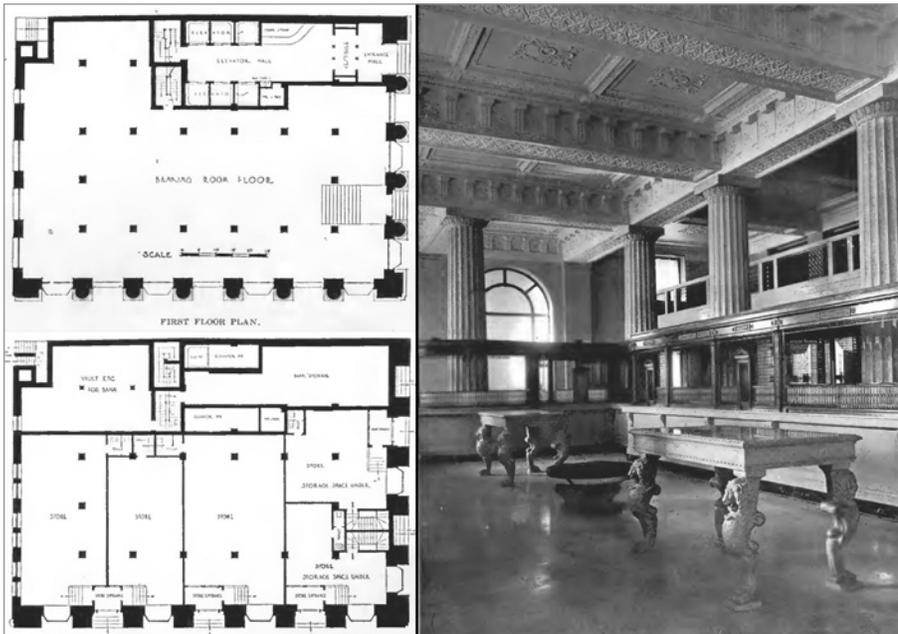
LEFT, ROYAL BANK RETAIL GROUND FLOOR AND BANKING HALL PLANS. RIGHT, INTERIOR OF BANKING HALL. | BOTH FROM *CONSTRUCTION*, JULY 1915, VOL. 8, NO. 7, P. 284 AND 283, RESPECTIVELY.
